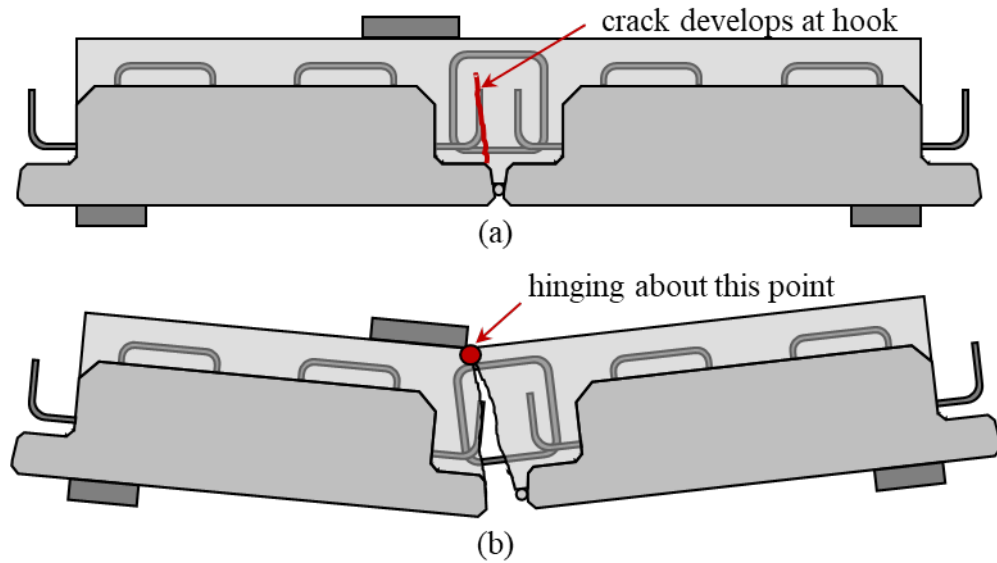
Failure mechanism in FSB-1 and FSB-2: (a) crack develops at vertical leg of hook reinforcement and (b) hinging occurs near load as joint reinforcement pulls out
